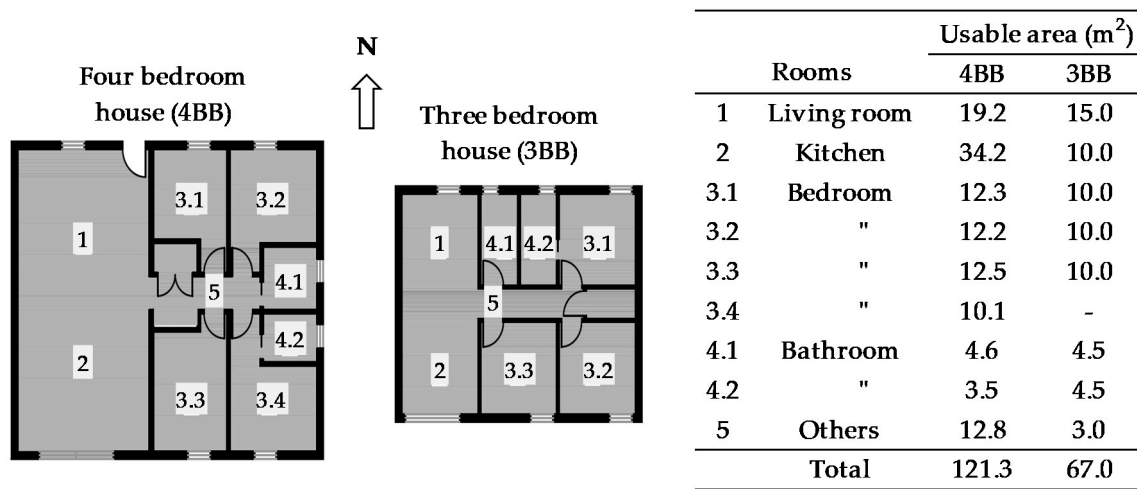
House layout: four-bedroom building (4BB) and three-bedroom building (3BB).
